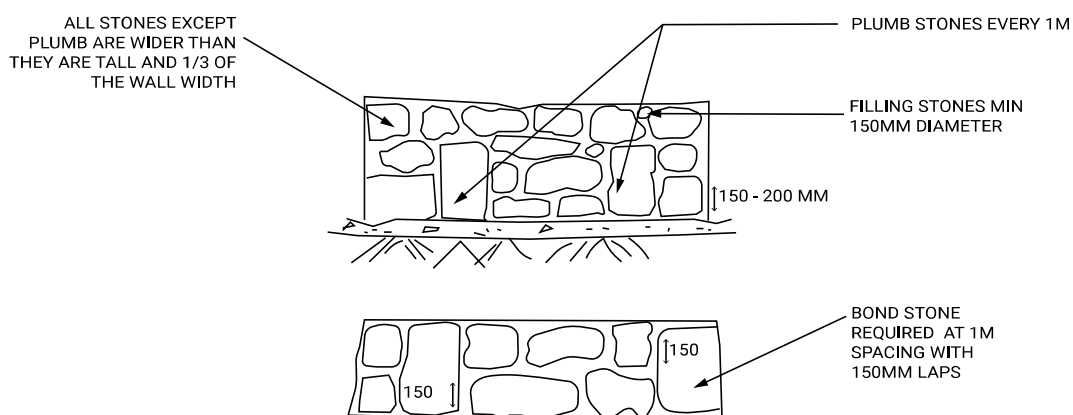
(b). Construction of stone masonry foundation (elevation and plan)
